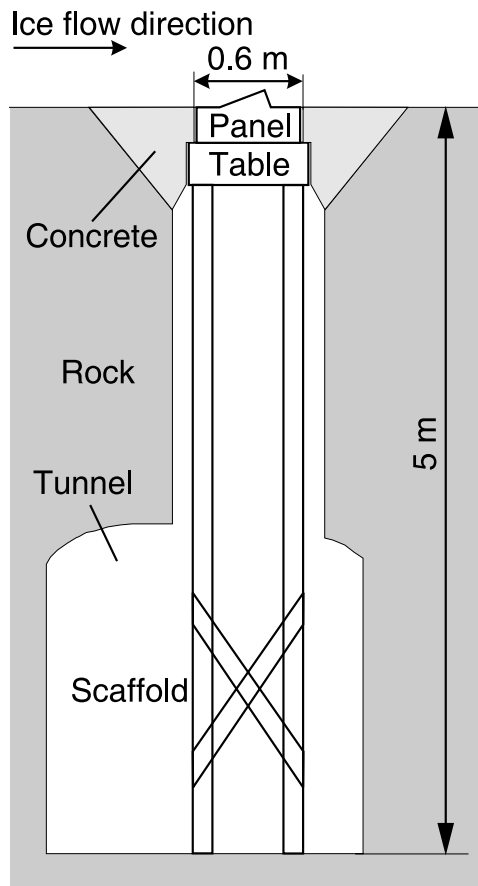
Cross section of tunnel and vertical shaft showing panel, supporting table, and scaffold.
